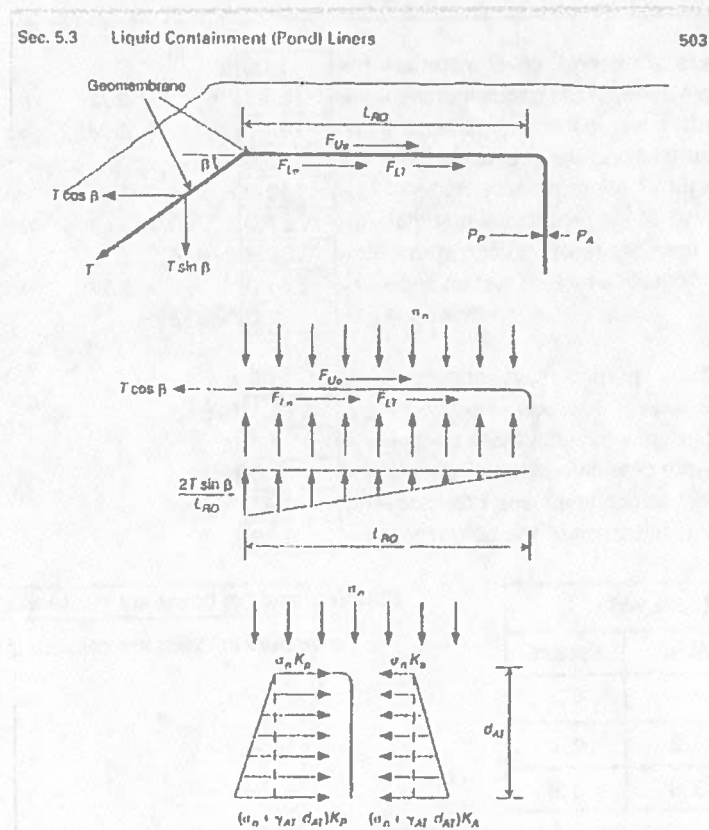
Cross section of geomembrane runoff section with anchor trench and related stresses and forces involved.
